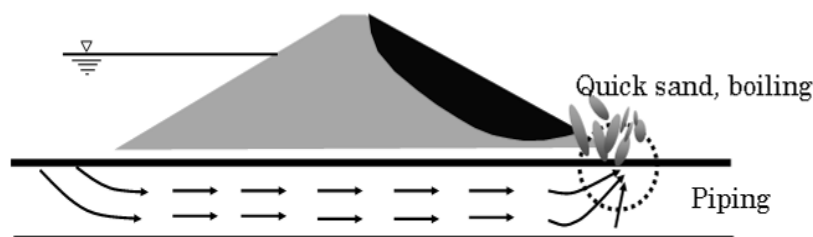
Seepage Failure of Dam Foundation
